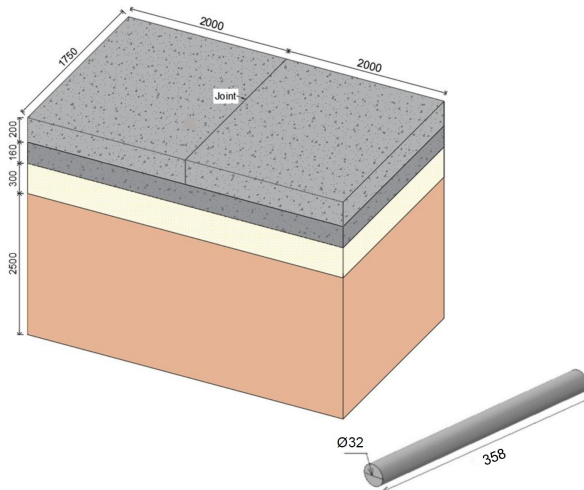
3D view of JPCP, with dimensions given in millimetres (Adapted from Paper III).
